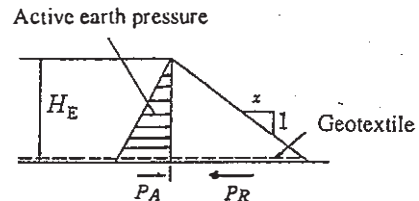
Stability calculation with respect to sliding of embankment on geotextiles²⁾
